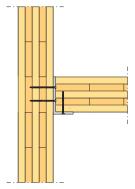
Joint between wall panel and floor slab using angle bracket.
